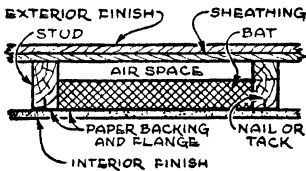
Application of Flanged Paper Backed Bats Less Than Wall Thickness
